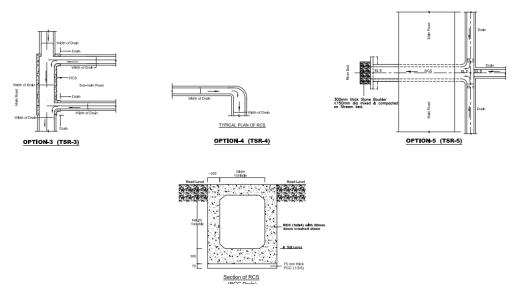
Typical section of Road Crossing Structure (option-3, 4 & 5)
